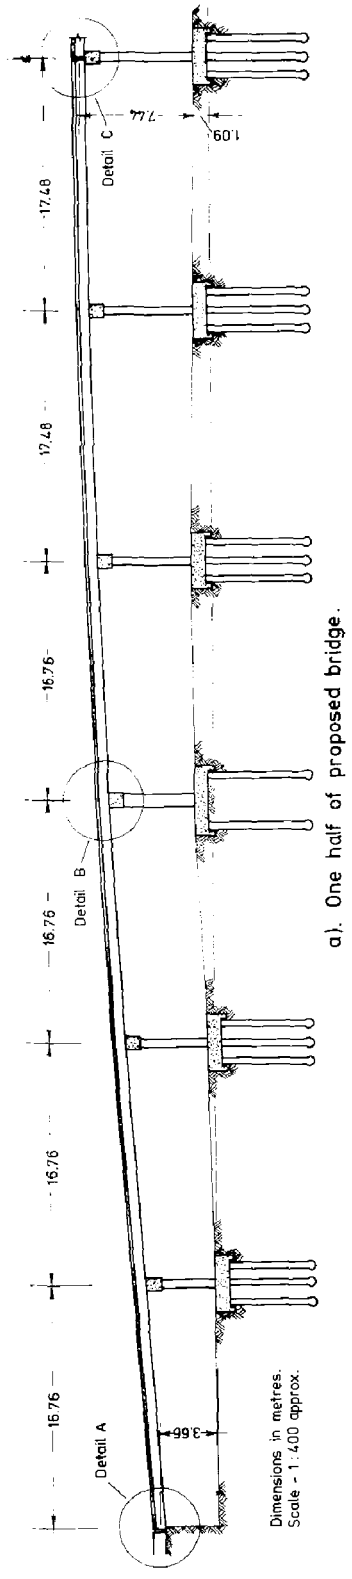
DURHAM STREET RAILWAY OVERBRIDGE, CHRISTCHURCH.
